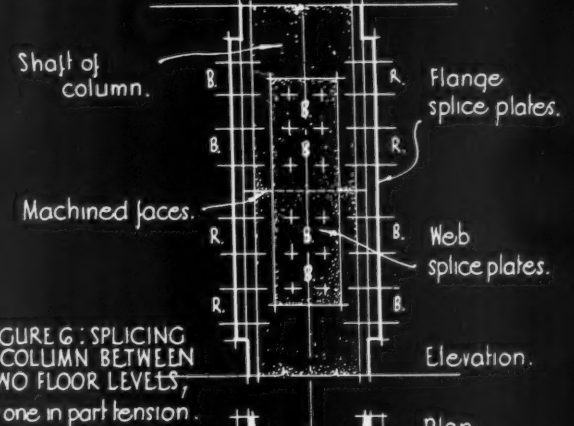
SPLICING A COLUMN BETWEEN TWO FLOOR LEVELS, or one in part tension.
